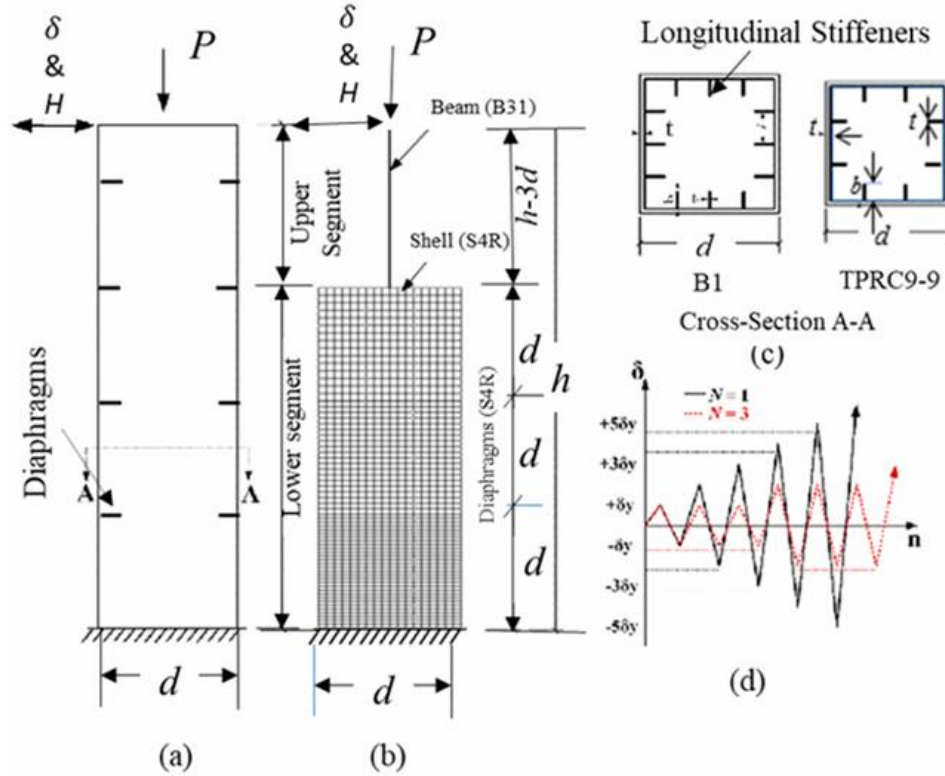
Finite Element Modelling (a) Column (b) FEM Meshing (c) Cross-section (d) Loading path protocol
